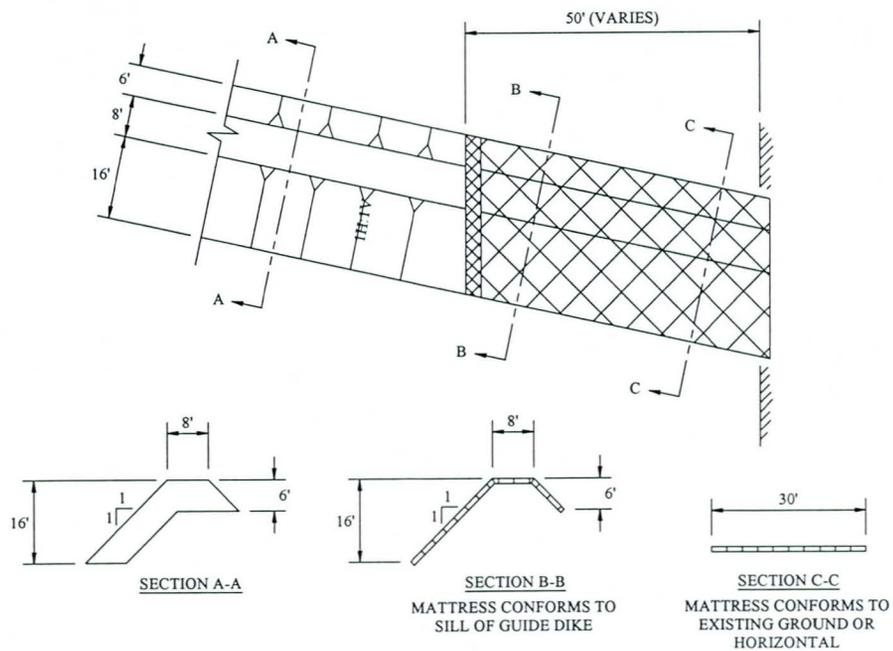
Plan view of revised guide dike design, end detail for layout of gabion mattress near outer bank.
